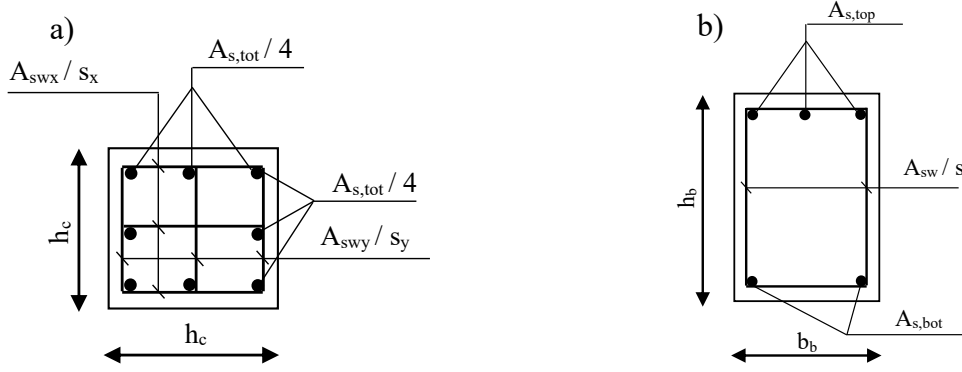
Assumed concrete cross-sections and steel reinforcement configurations: a) columns; b) beams
